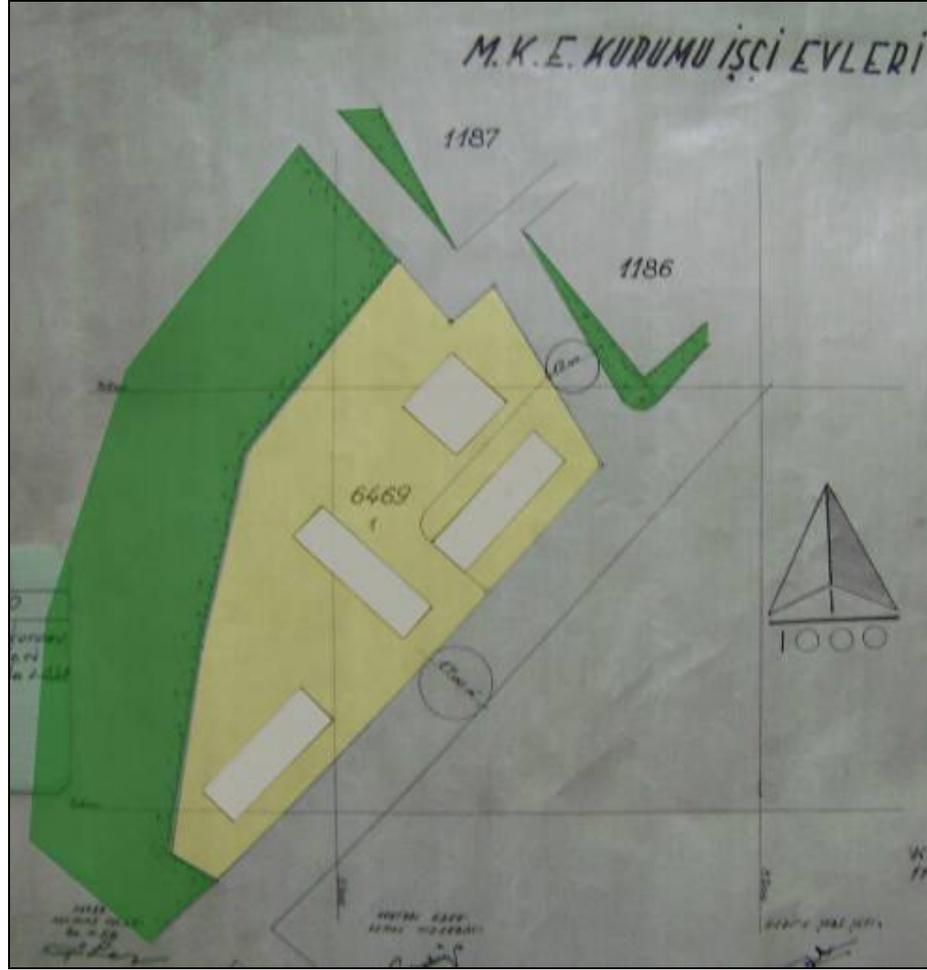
The plan showing the allocation and the layout of the MKE workers' dwellings on the corner of Süleyman Bey Street and Şehit Gönenc Streets. (Plan no. 36490, 11.4.1958. Plan Archive of the Greater Ankara Municipality)
